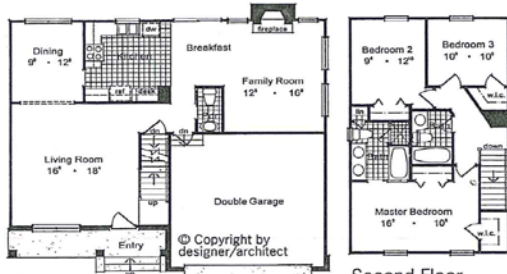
EXHIBIT B: SITE PLAN & PROPOSED DEVELOPMENT PROTOTYPE CONT'D
